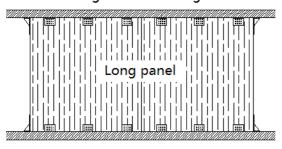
Distributed ductility and damping concept for multi-story buildings
